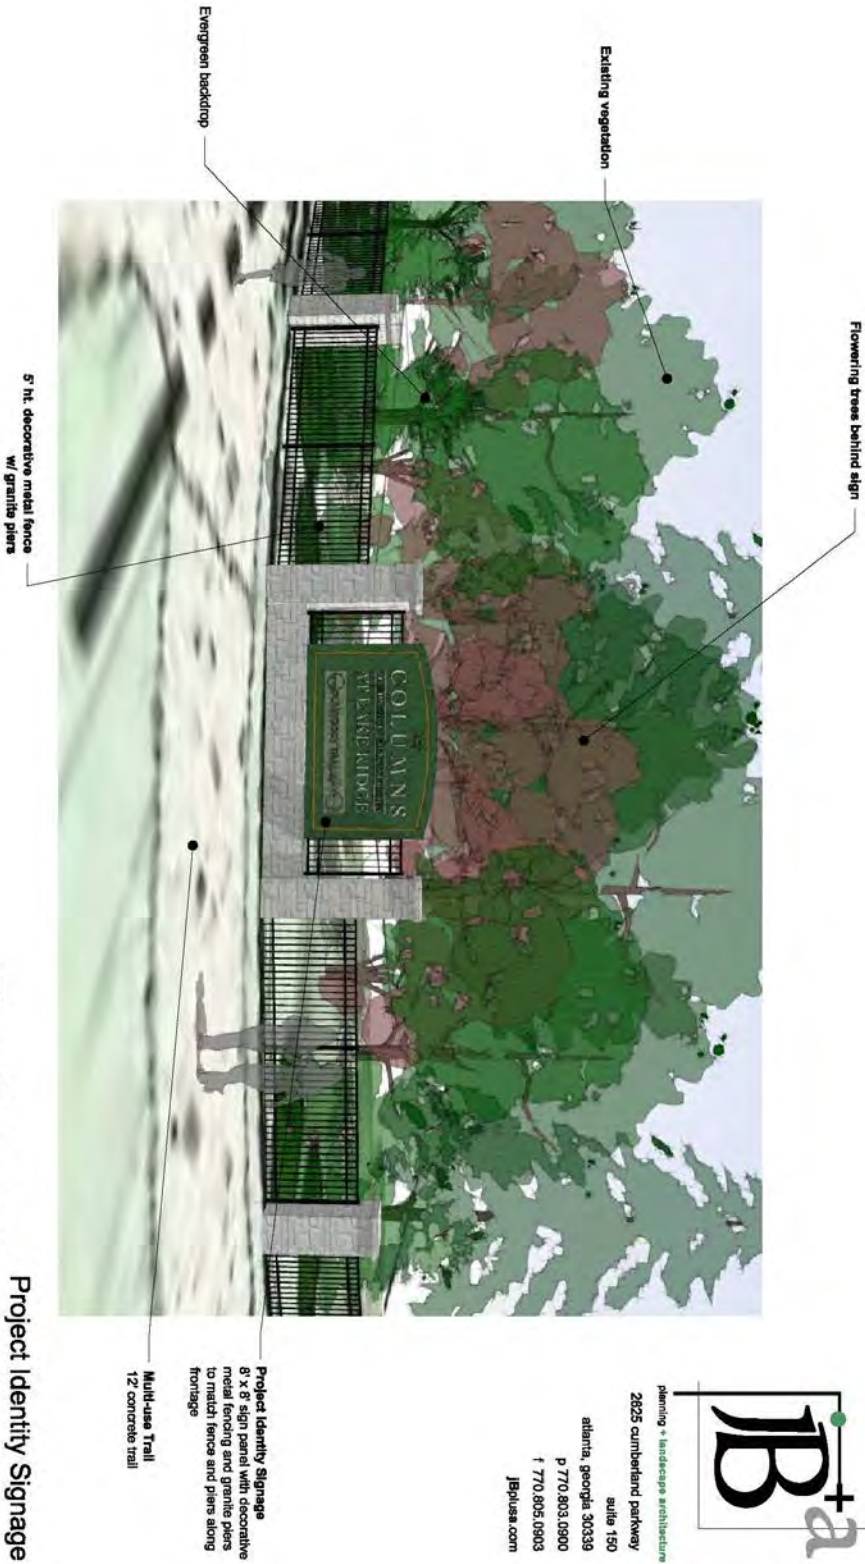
EXHIBIT “F” – NORTH SHALLOWFORD ROAD SIGN
